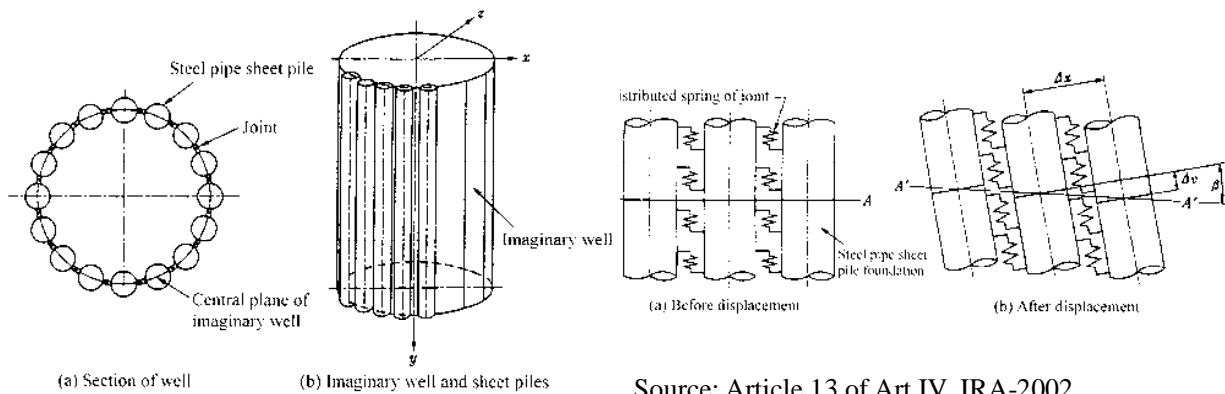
Calculation Model of Steel Pipe Sheet Pile Foundation
